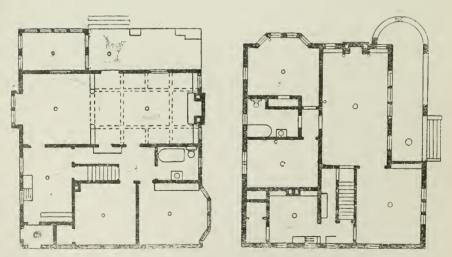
FIRST FLOOR PLANS. REINFORCED CONCRETE BUNGALOWS, CARNEGIE, PA., U.S.A.
